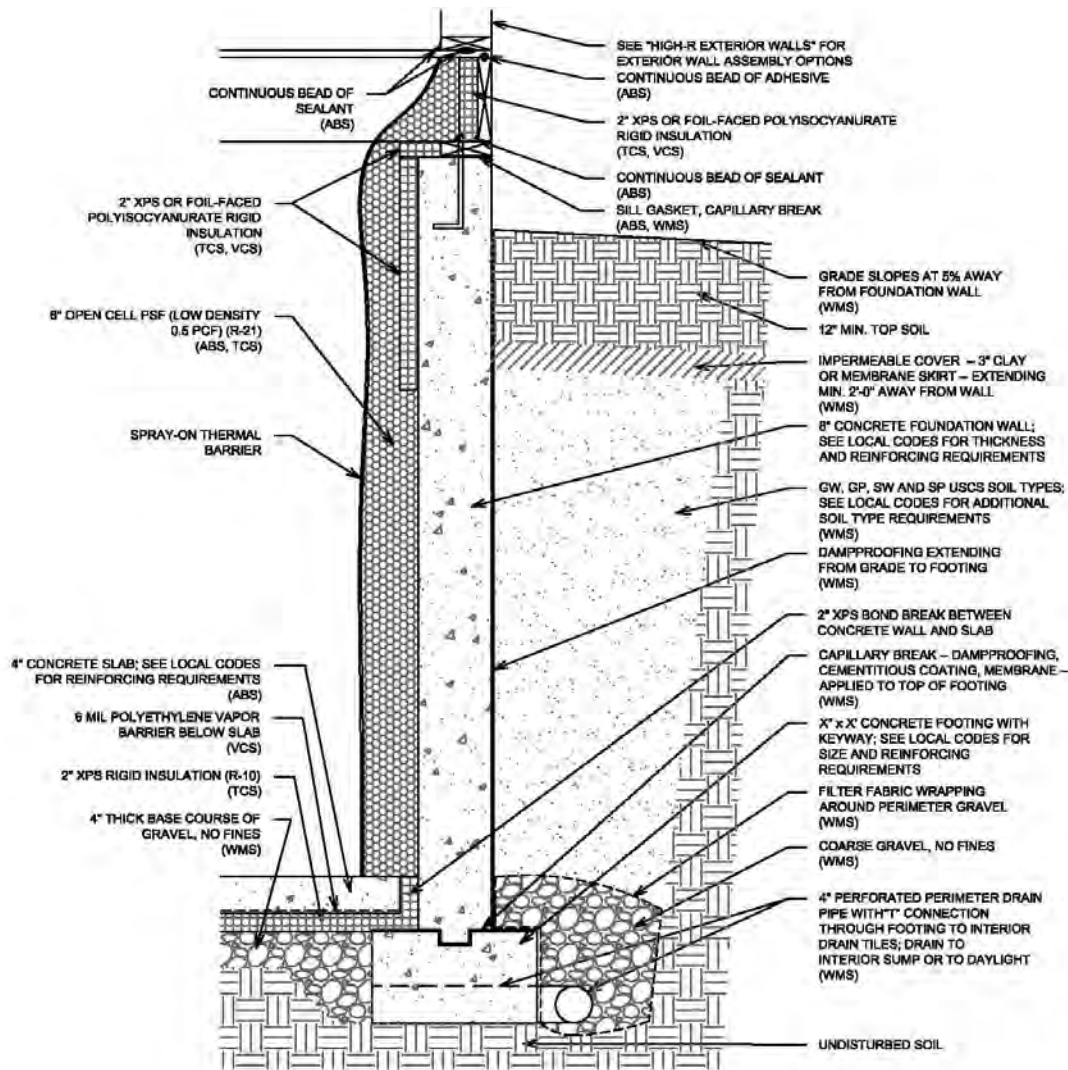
Case 7 Detailed Drawing – Recommended Foundation Wall System
